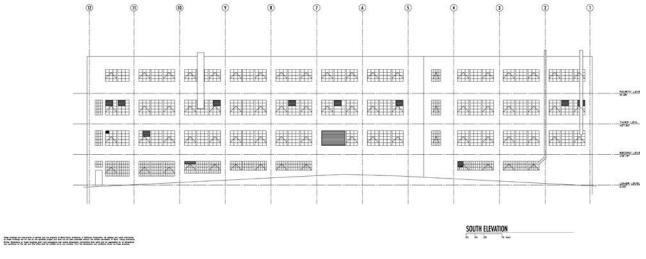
Existing and Proposed South Elevation (No exterior changes proposed)
